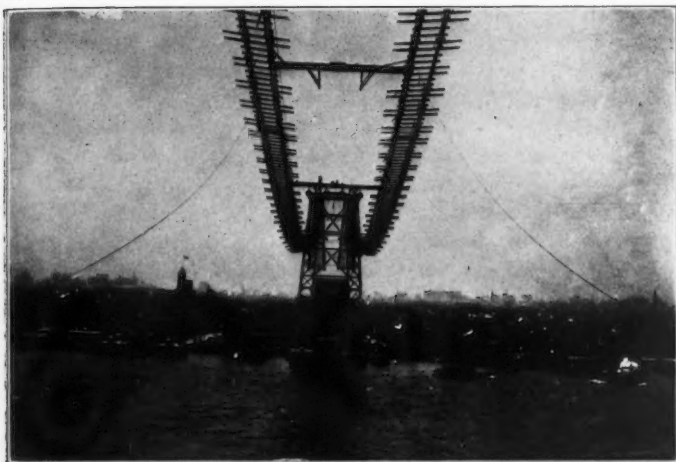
LOWER DECK OF MAIN SPAN OF FOOTBRIDGE.
